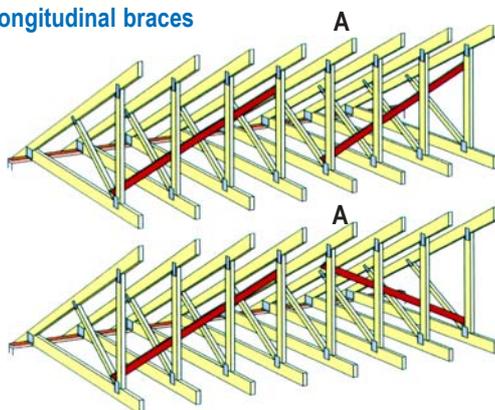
Alternative fixing arrangement for chevron braces (truss span over 8m)
